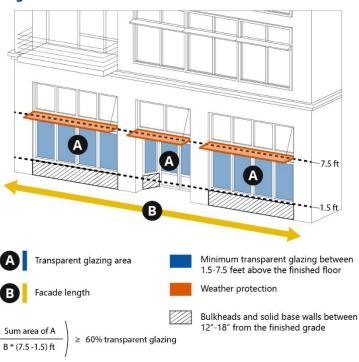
GROUND FLOOR STOREFRONT/ RETAIL FACADE
